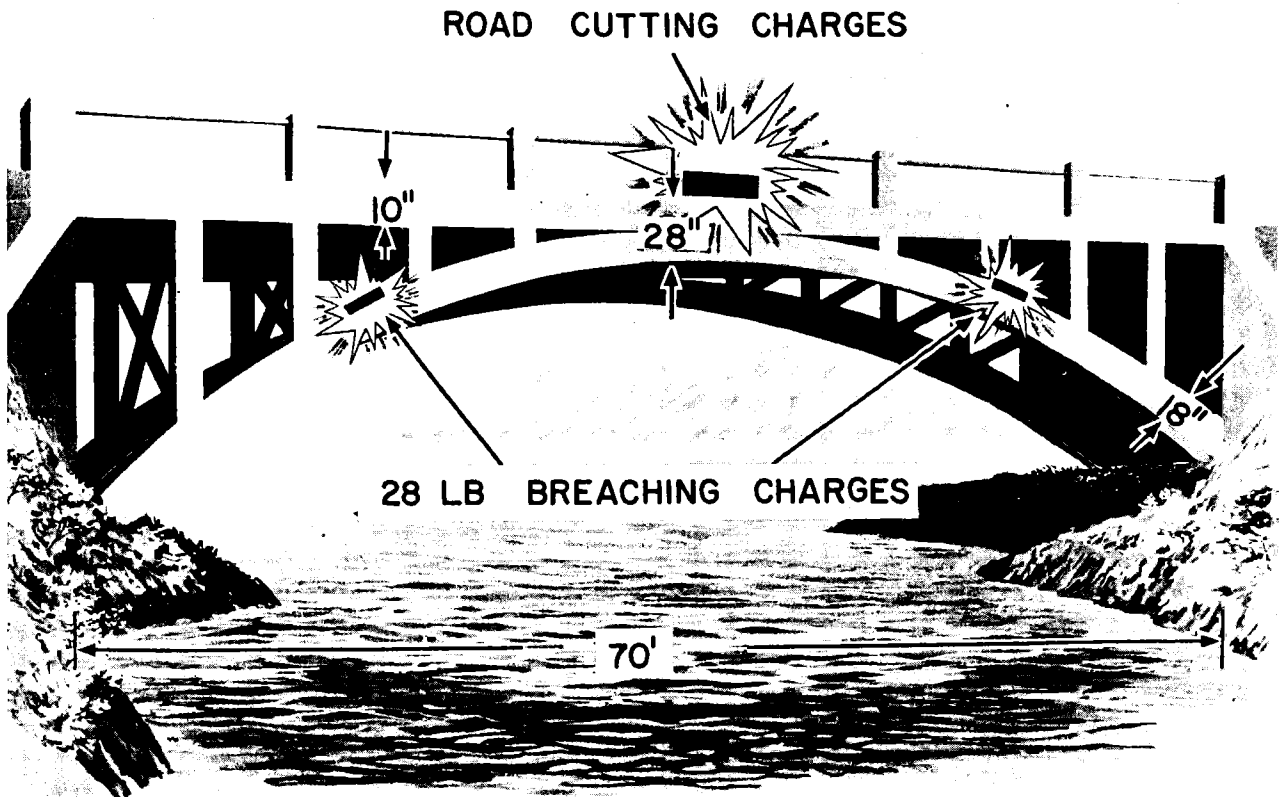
Demolition of a reinforced concrete open spandrel arch bridge.
